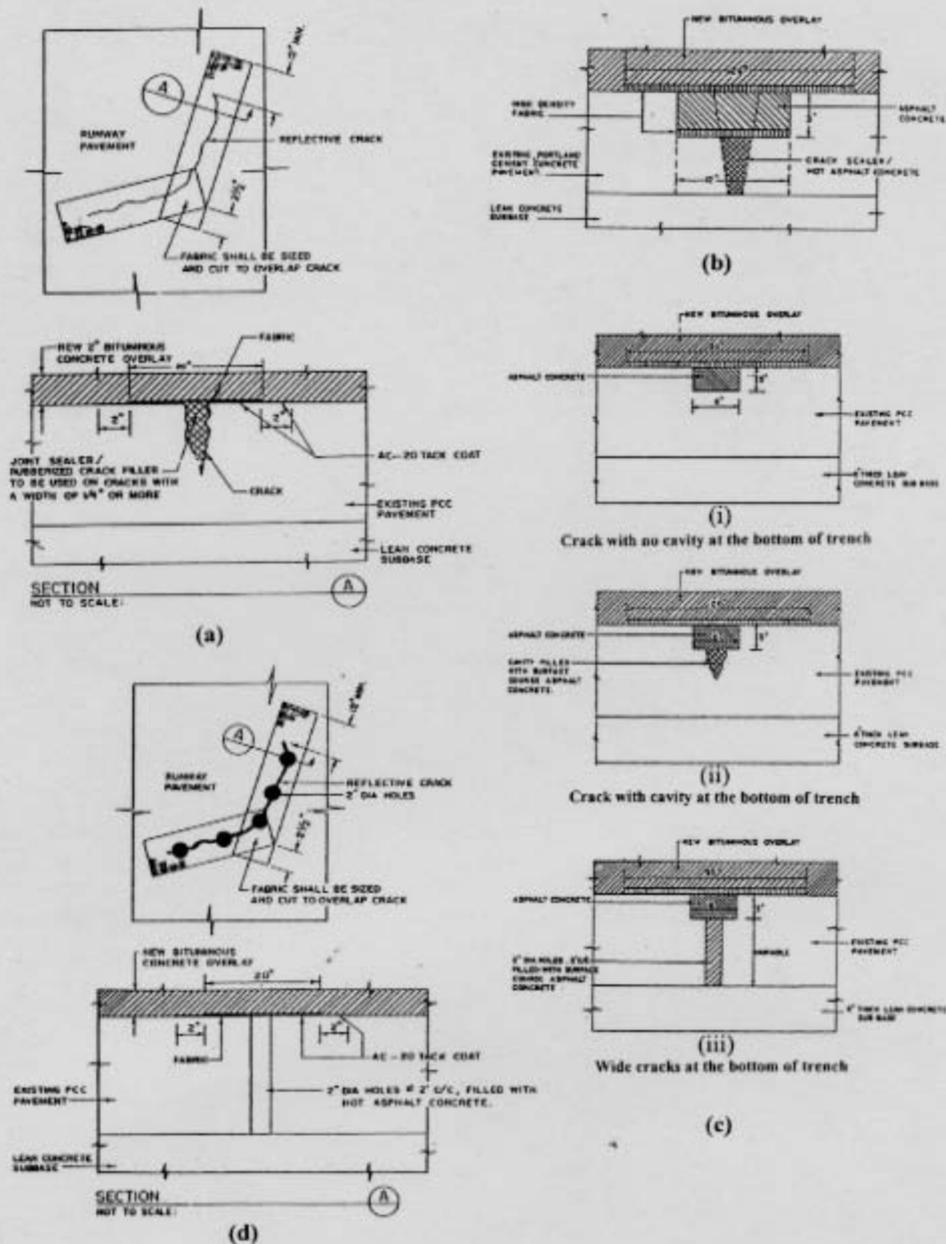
(a) Typical crack repair (crack width 1/4 - 1 in.) and placement detail of fabric, (b) repair of more than 1 in. wide Type 1 cracks, (c) repair of more than 1 in. wide Type 2 cracks, and (d) repair of more than 1 in. wide Type 3 cracks.
